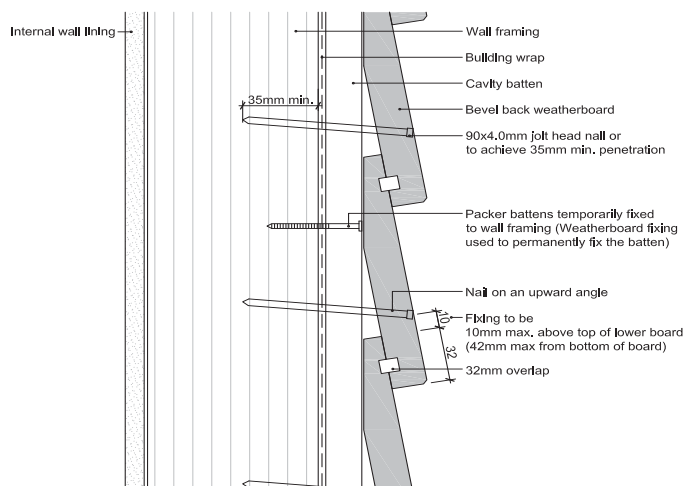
Bevel back fixing- Stain finish packer cavity batten
